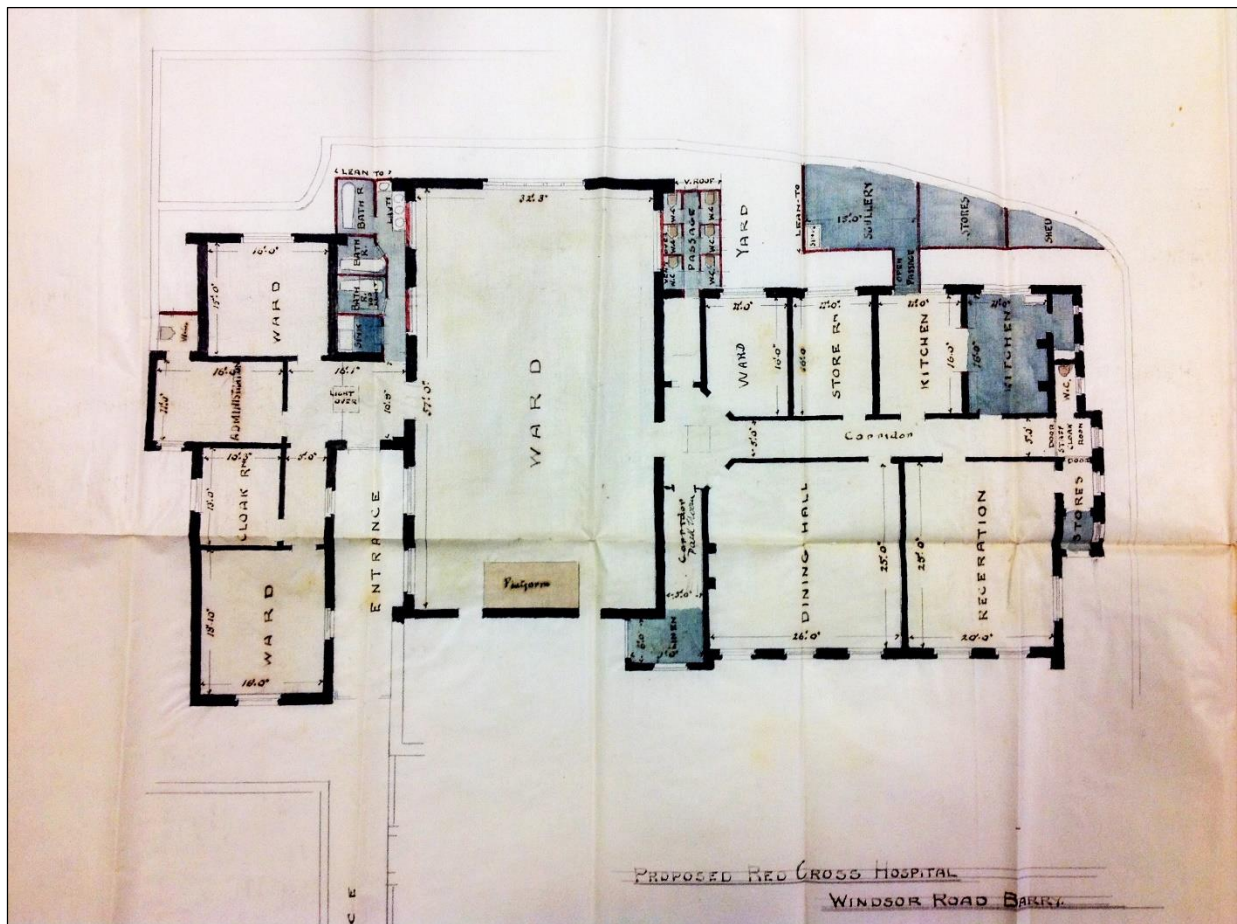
Plans showing the proposed layout for the Windsor Road Hospital (Glamorgan Archives DECONG10/51)
